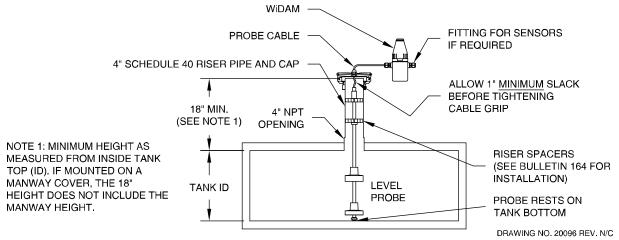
Riser Pipe Mounting Aboveground Tanks
